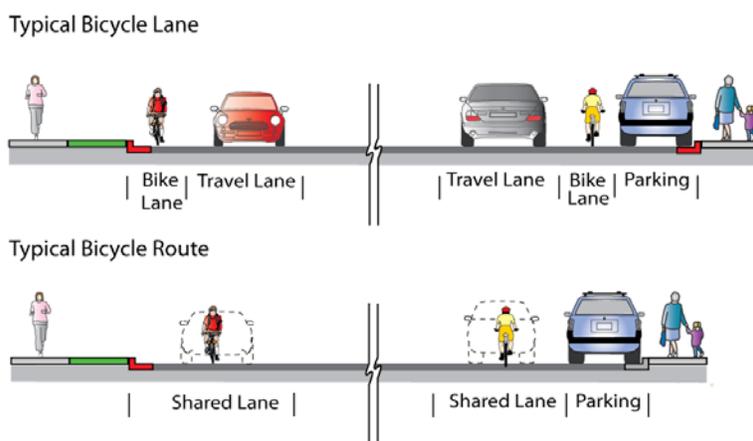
Typical bicycle lane and bicycle route accommodation with and without on street parking
